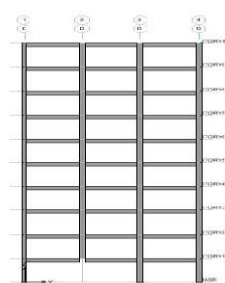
Floating column in the outer face of the ground floor for Model FC. (In ZY plane).
